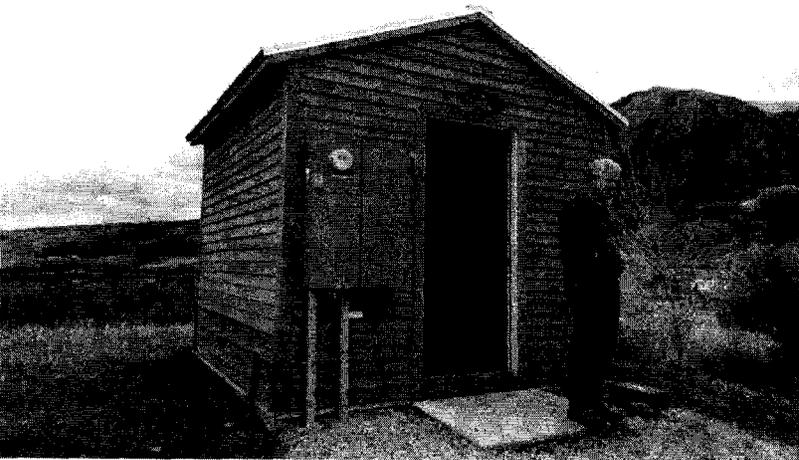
New Pump House #2, location of Fire Hydrant #5.
